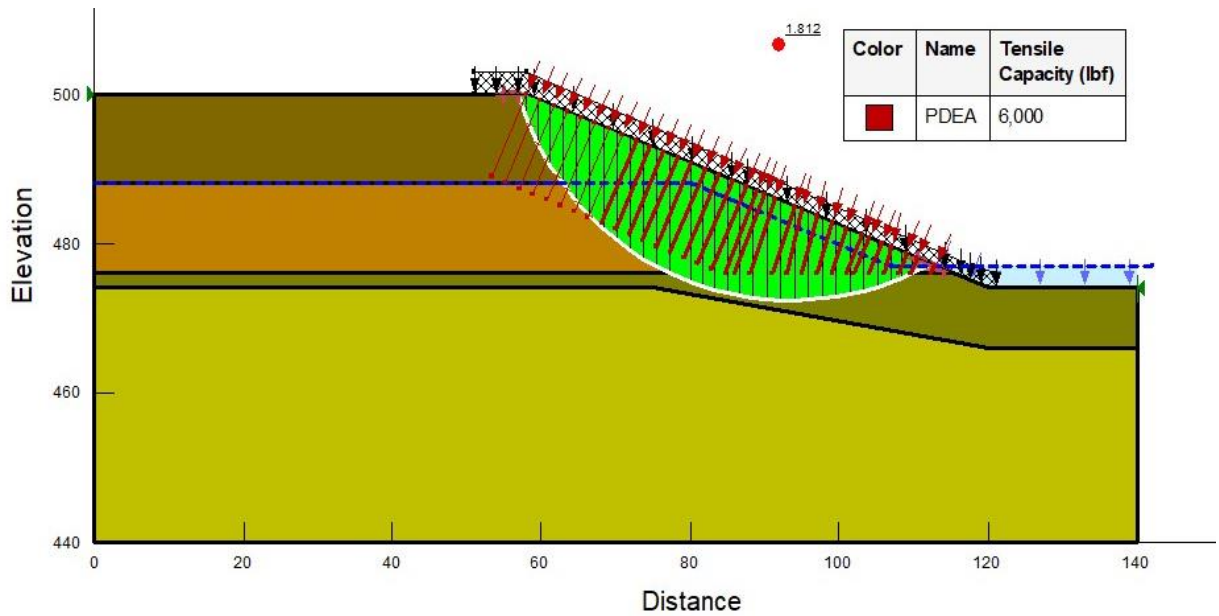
Slope with Anchor and Surcharge, FS=1.812 (Dimension in ft)
